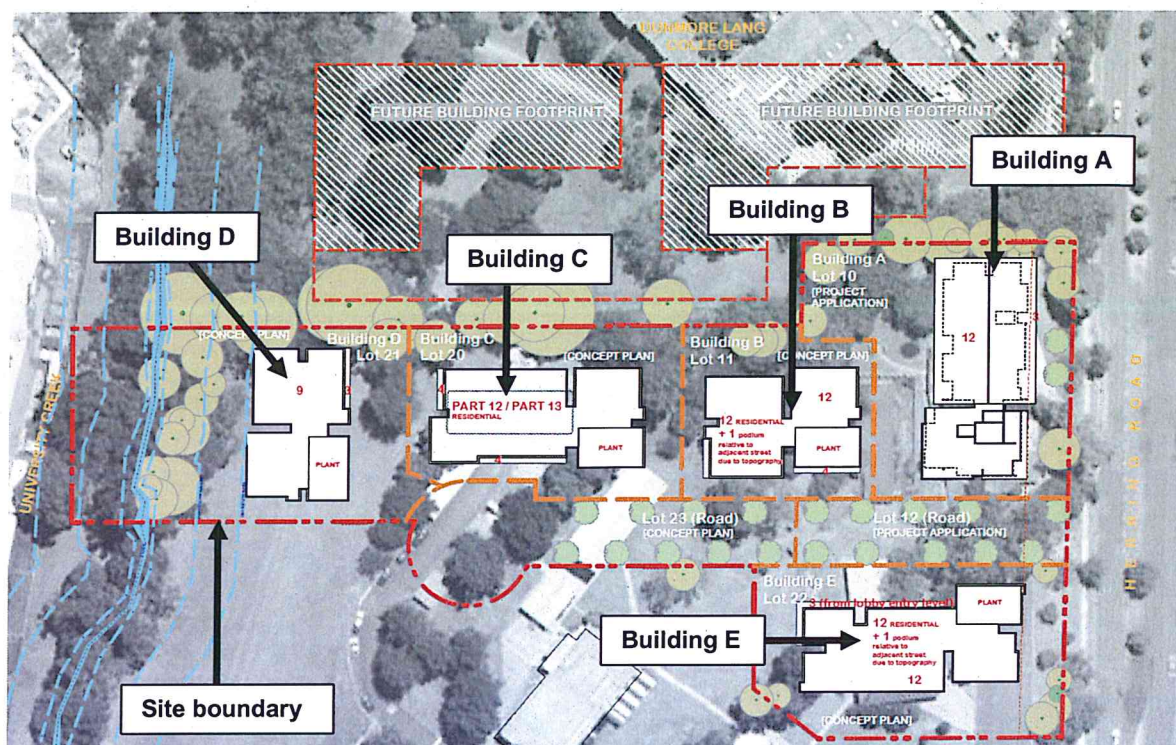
Site Context Plan Demonstrating the Layout of the 5 Buildings and Internal Road
